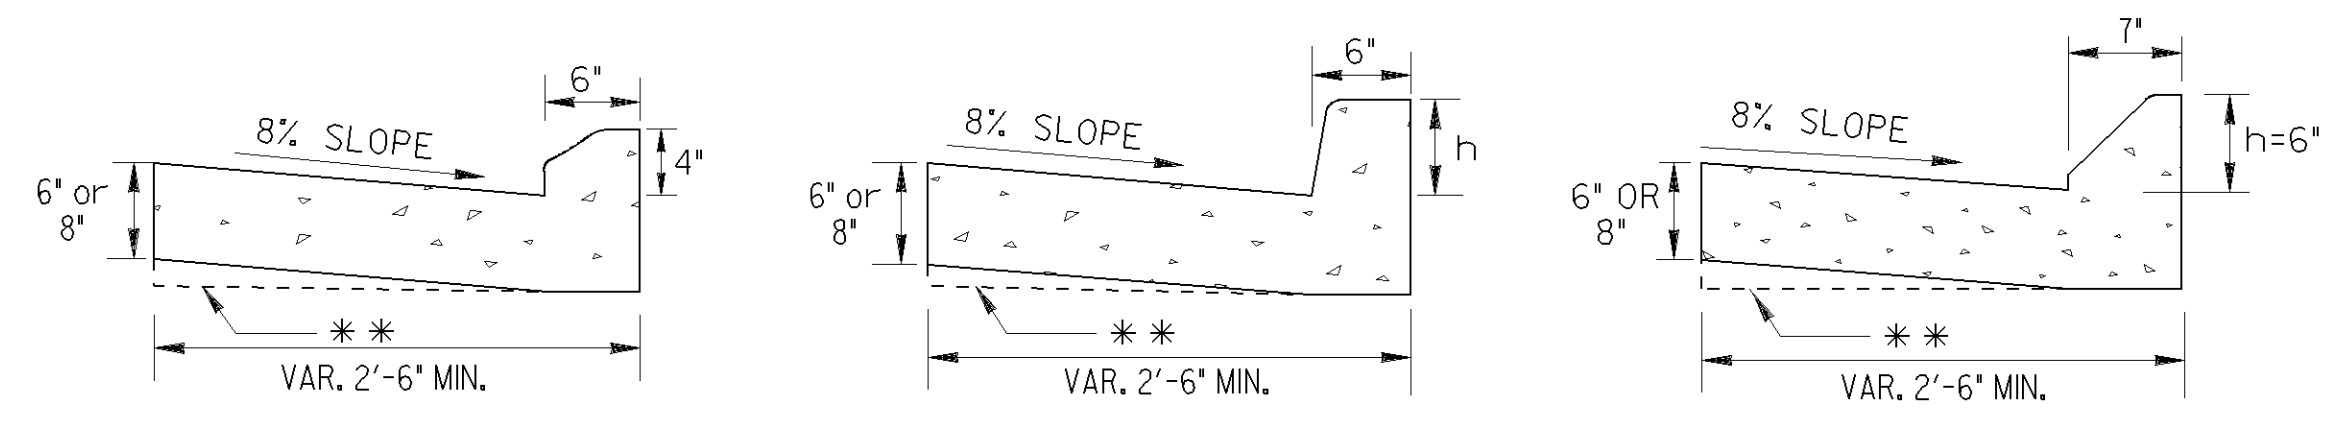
DETAILS OF RECESSED CURB FOR DRIVEWAYS
